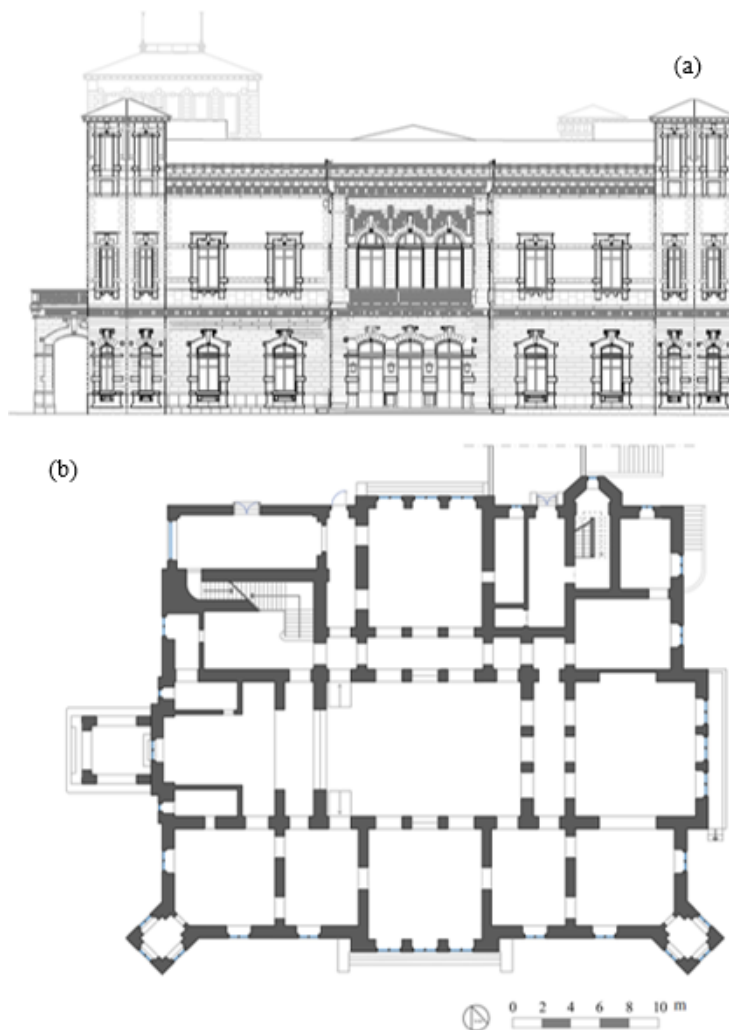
Main Facade and first floor plant: (a) Main Façade and (b) First floor plant
